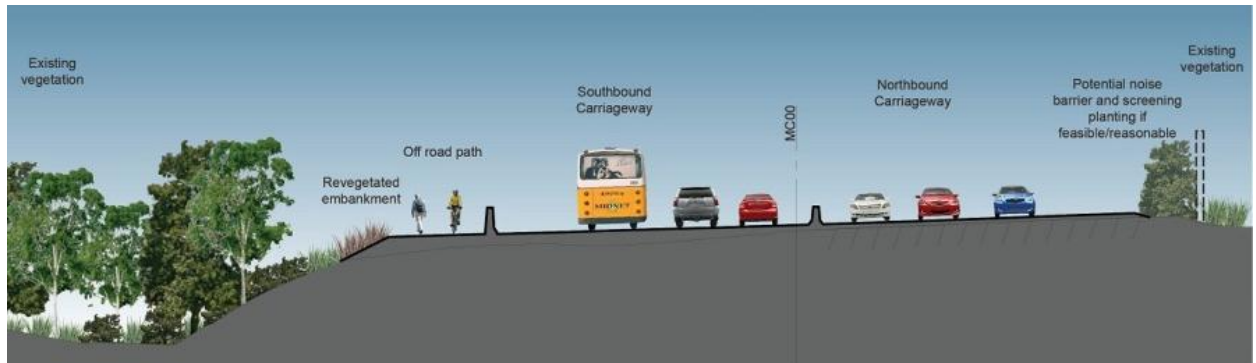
Indicative road cross section 800 metres south of Alfords Point Bridge
